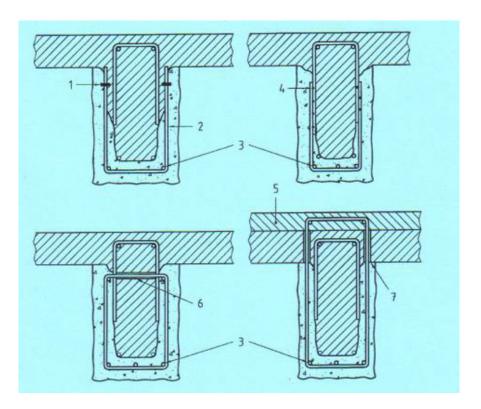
Reinforcement 1: reinforcement for anchoring new reinforcement in existing concrete (connectors); Reinforcement 2: shear force transverse reinforcement (usually welded mesh); Reinforcement 3: longitudinal flexion bending reinforcements (usually bars); Point 4: welding points between existing and new reinforcement (solution to be justified); Point 5: concrete poured at the top of the beam (increase in inertia); Points 6 and 7: various drilling for the passage of new reinforcements
